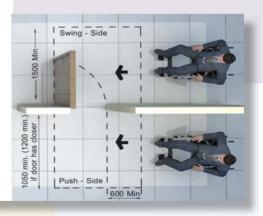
Maneuvering Space Needed for Wheelchair Users to Approach Doors
